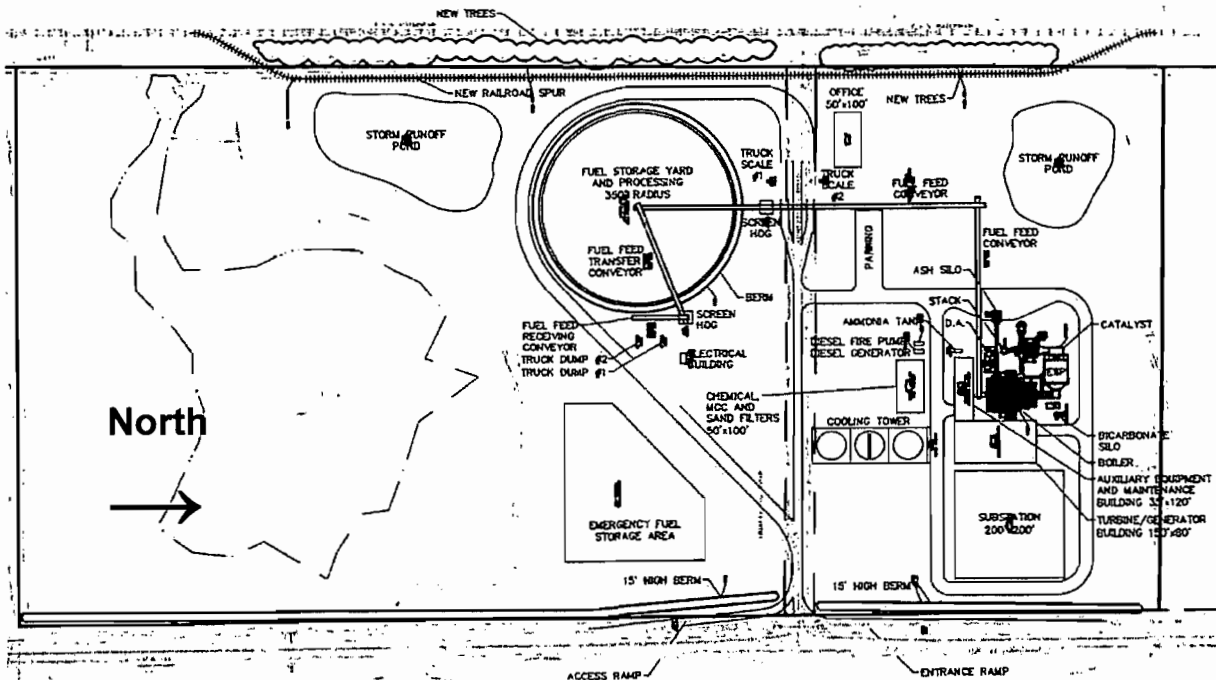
Proposed Layout between US Highway 41 and the CSX Railroad
